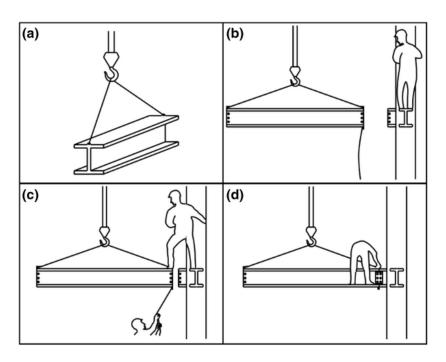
Plans and schedules in erection of structural steel assemblies
